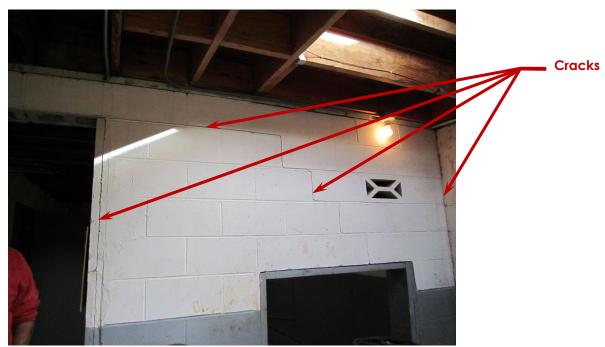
Chlorine Pump Storage Room North Wall (Looking North)
